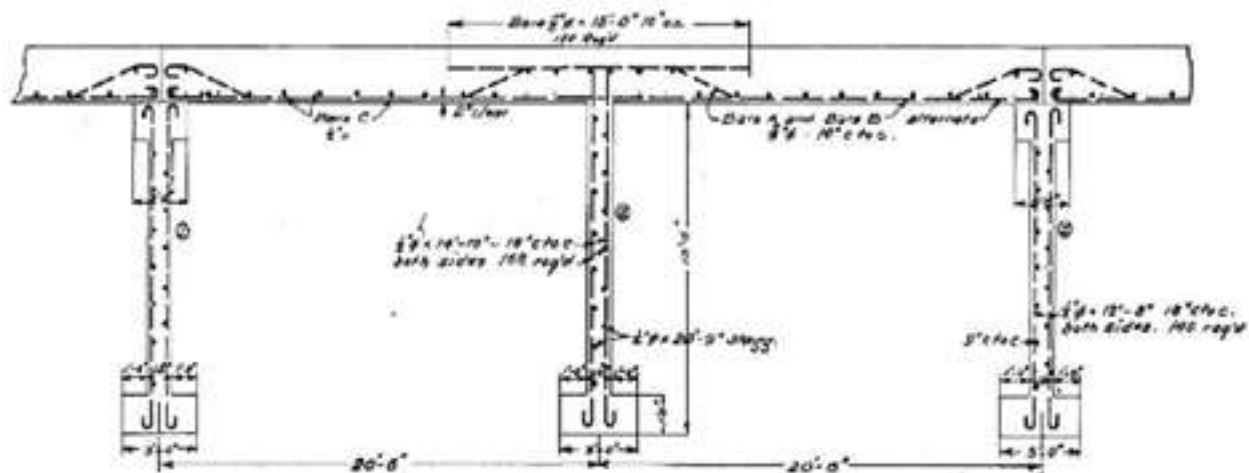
Longitudinal Elevation Section of Two-Span Continuous Bridge in Fayette Co. from SHDA (1924)
